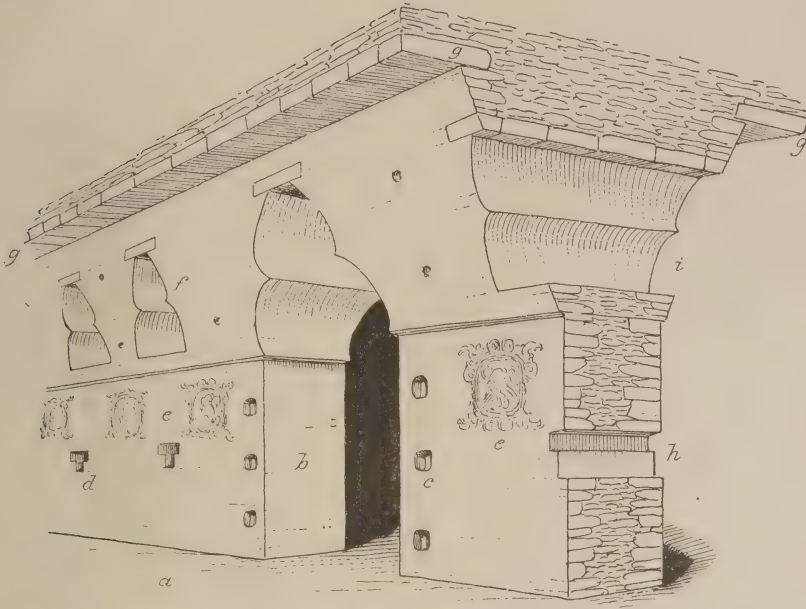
INTERIOR DOORWAY WITH SECTION OF MEDIAL WALL AND CEILING.
